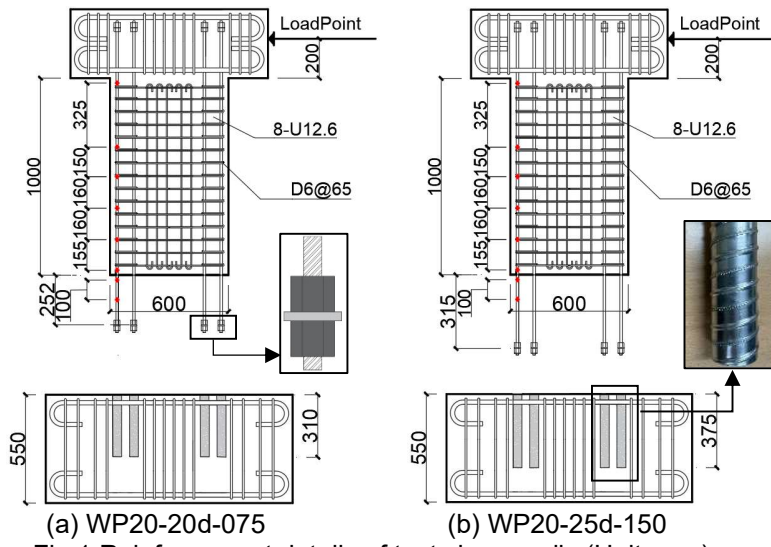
Reinforcement details of test shear walls (Unit: mm)
